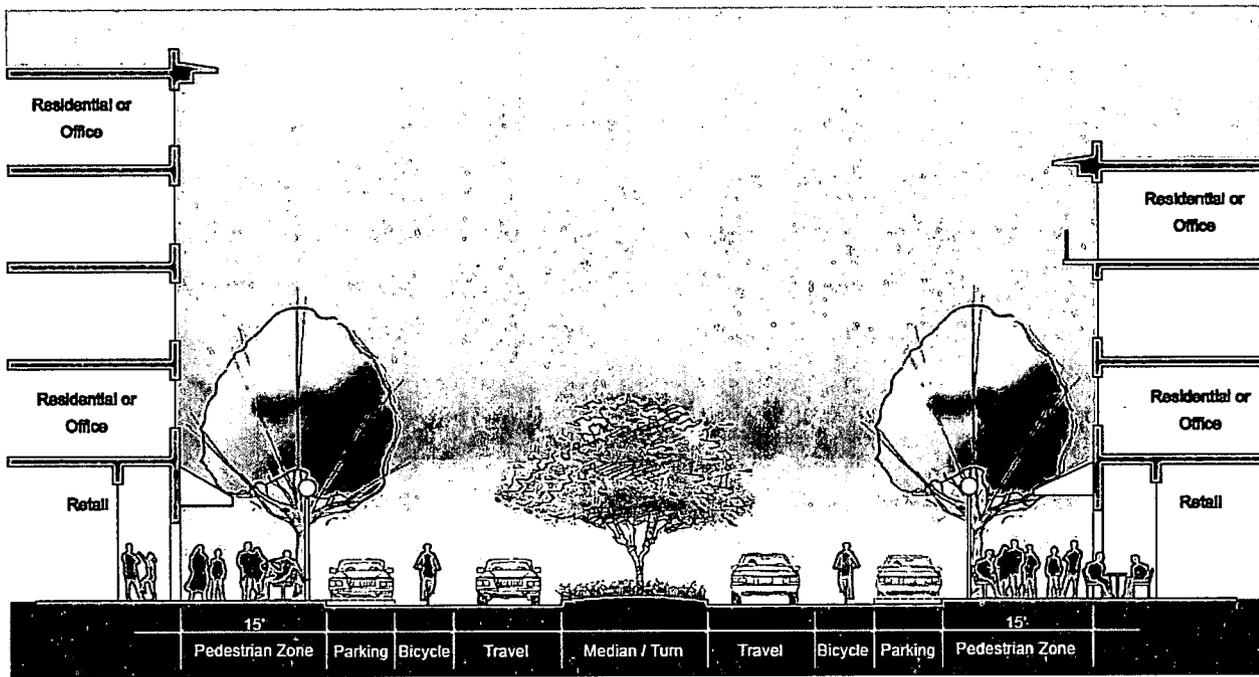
Folsom Boulevard between 59th Street and 62nd Street
